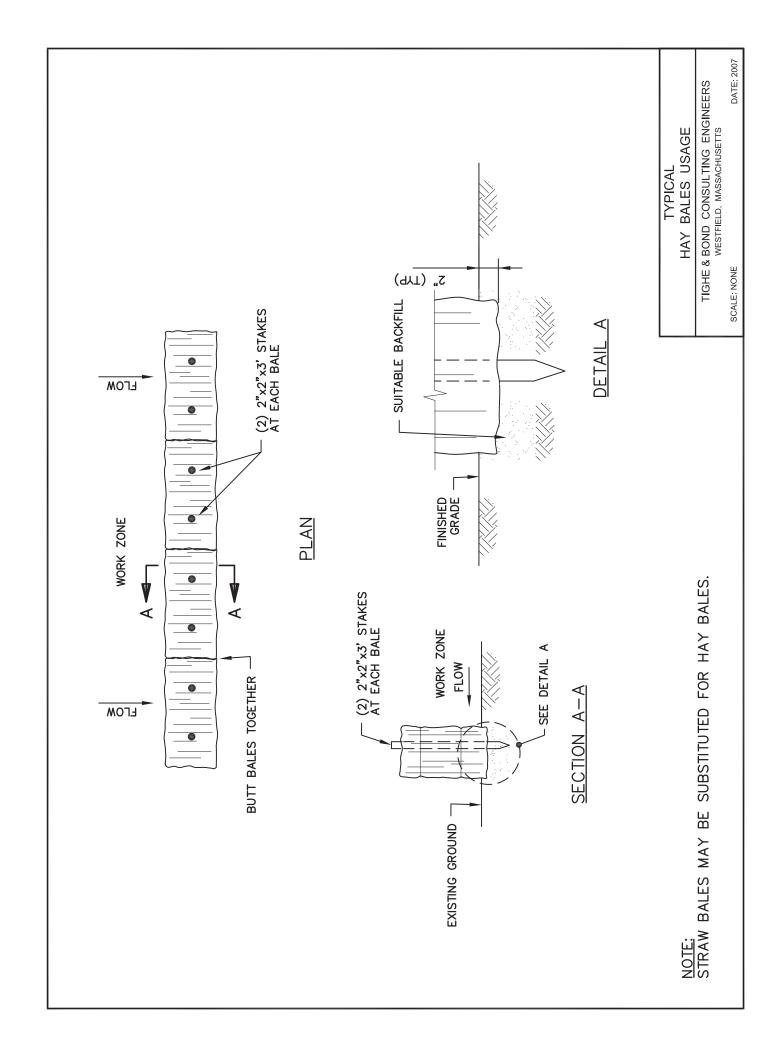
Sediment and Erosion Control Details Frost Bridge Substation
